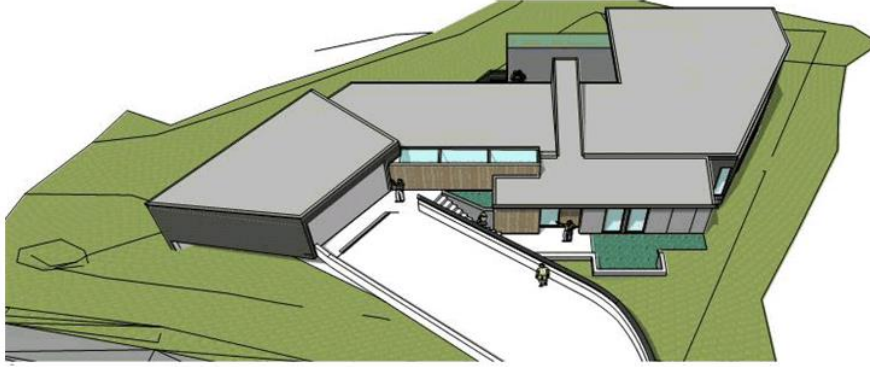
Model perspective showing the street elevation. Source McGrath Reed.
